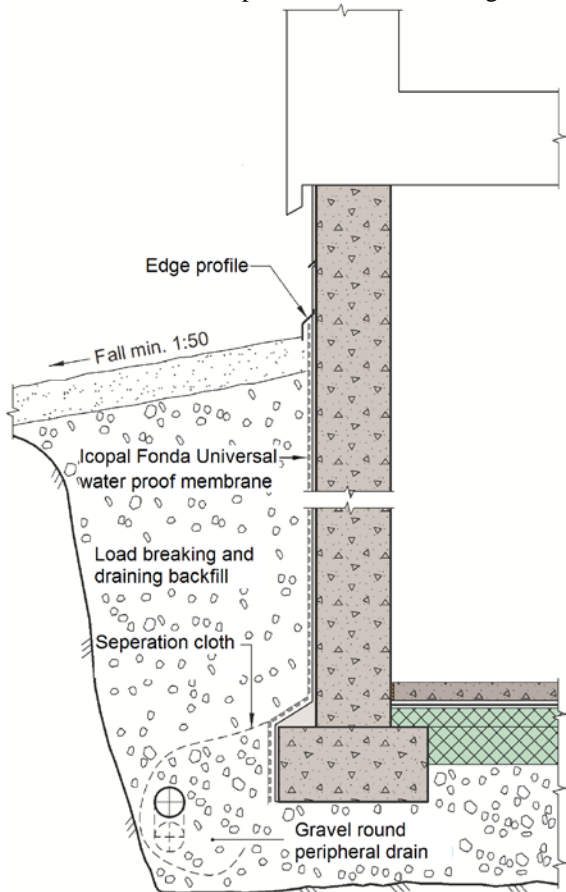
Example of the use of Icopal Fonda Universal on exterior wall of unheated cellar.
